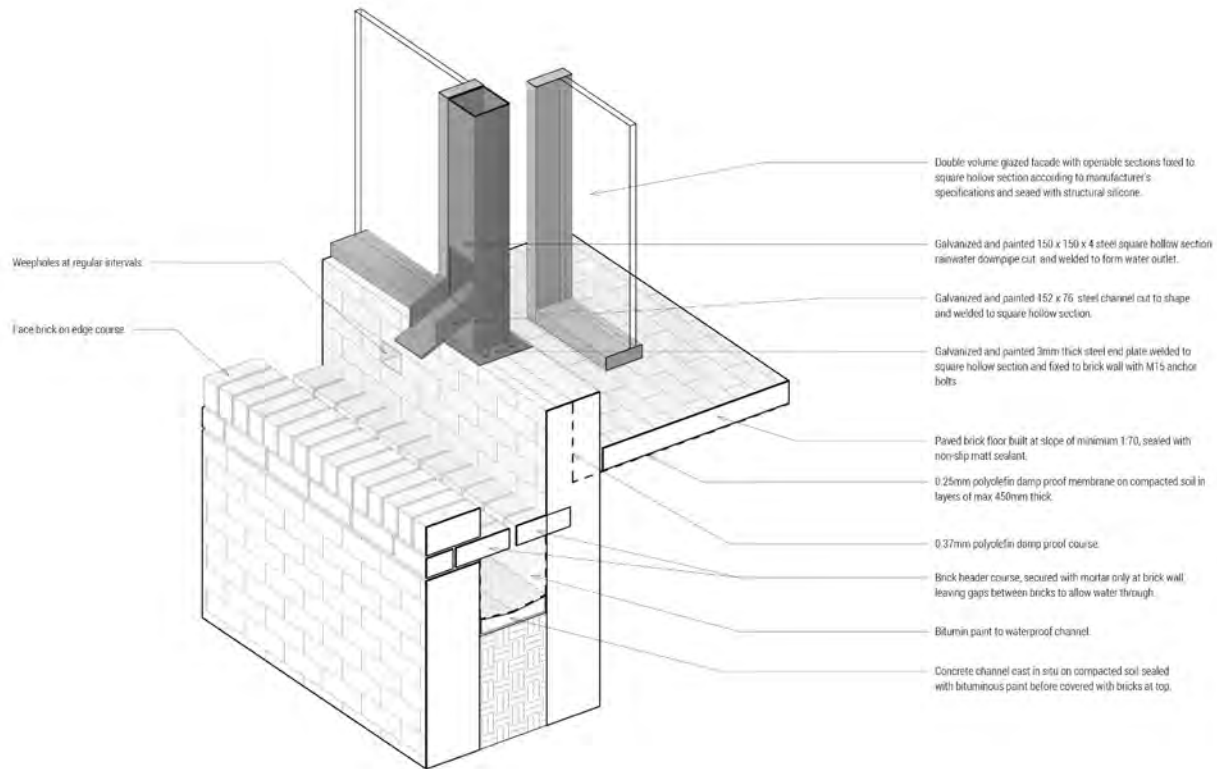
Three-dimensional detail drawing of rainwater downpipe structure and water channel (Author, 2017).
